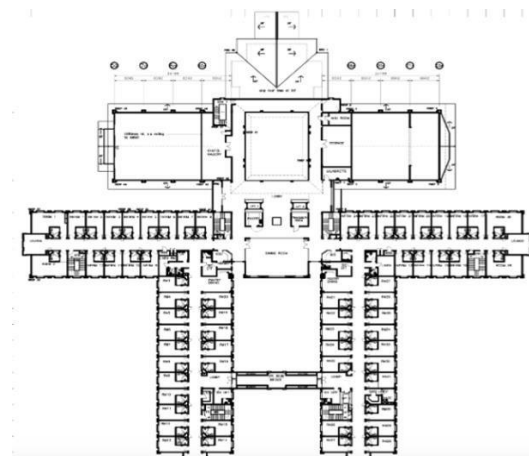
First floor plan of St. Francis Xavier Home for Elderly showing the layout of rooms and dining area in the middle
